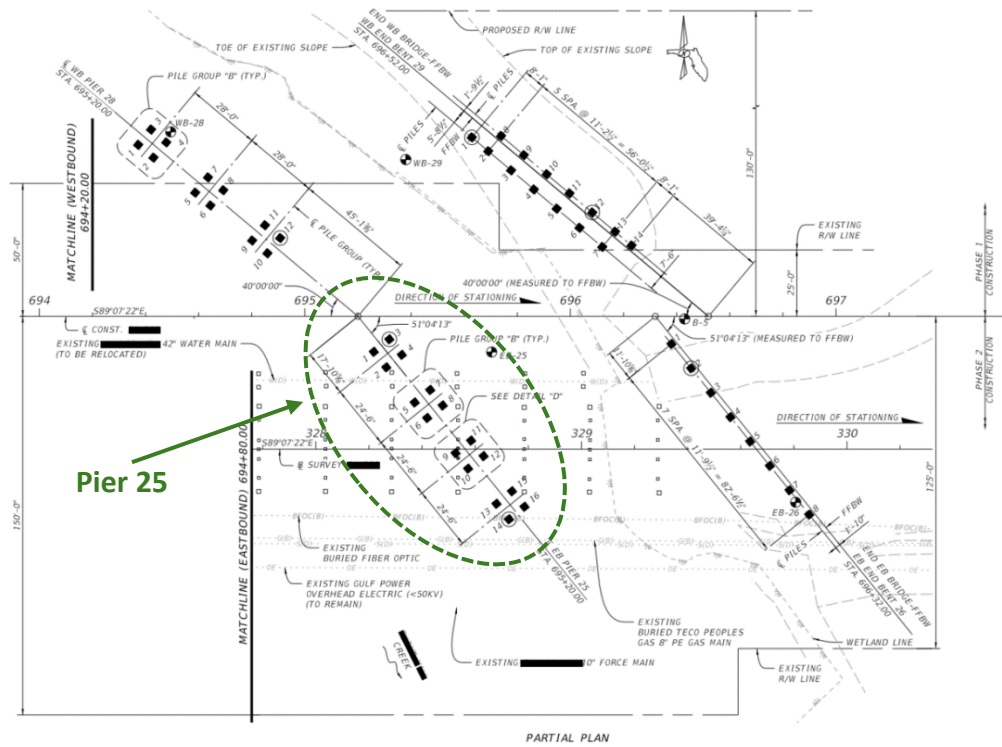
Partial foundation layout plan – Selected Pier no.25 of the Eastbound Bridge (B1-84)
